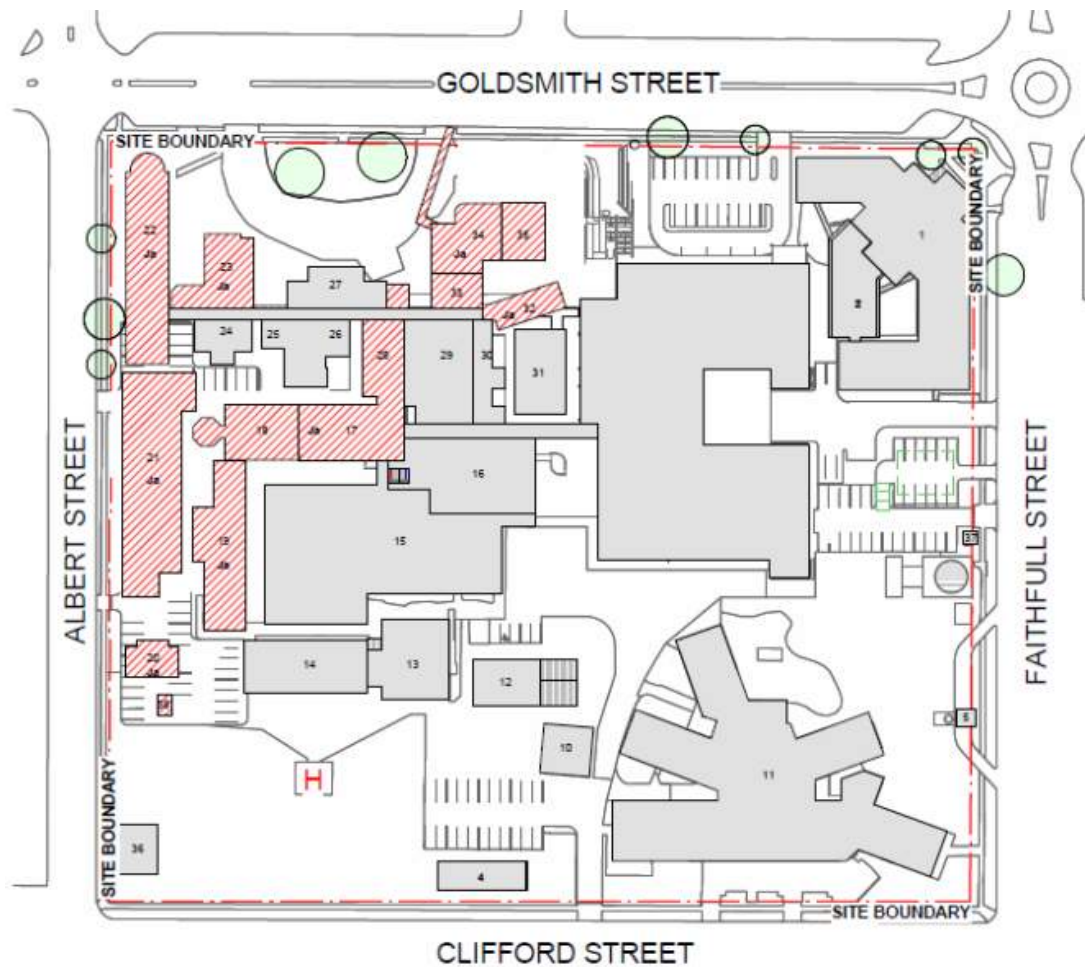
Demolition plan extracted from the Architectural Design Summary (Source: BLP).
